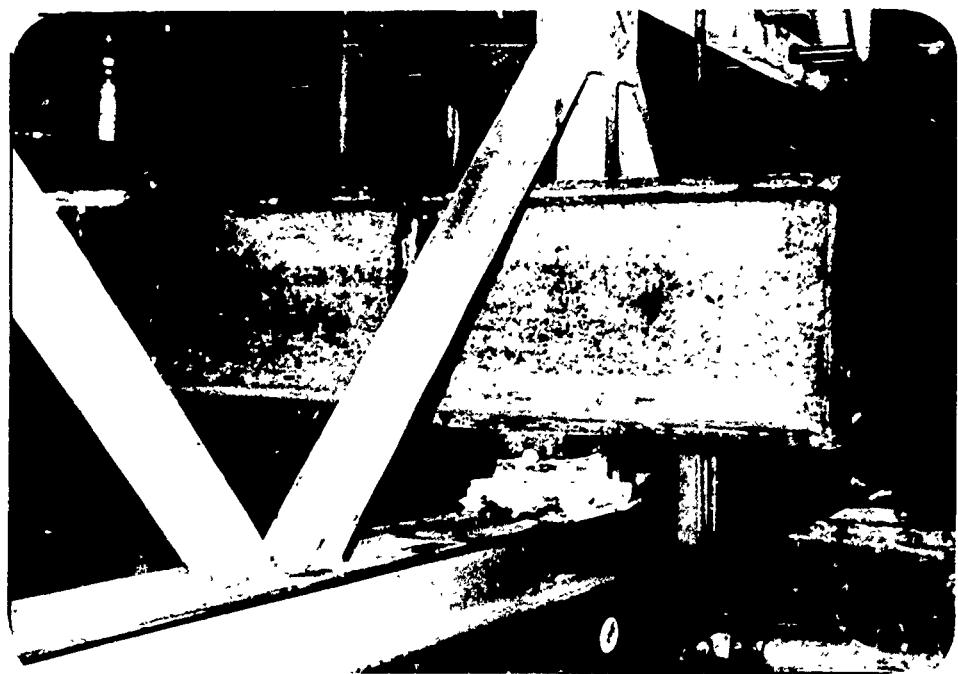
Hinge support of main girder on Panel A (Test No.2)
